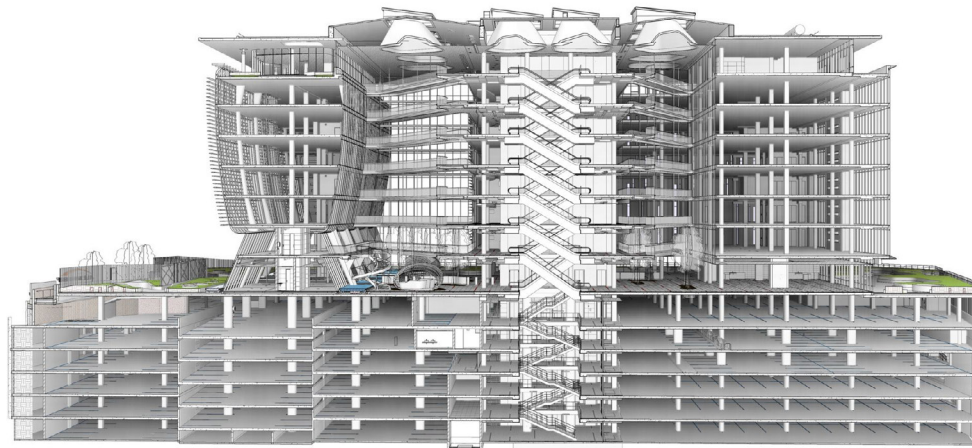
Section through atrium of building showing cloud like light sources (Arch Daily, 2012)
